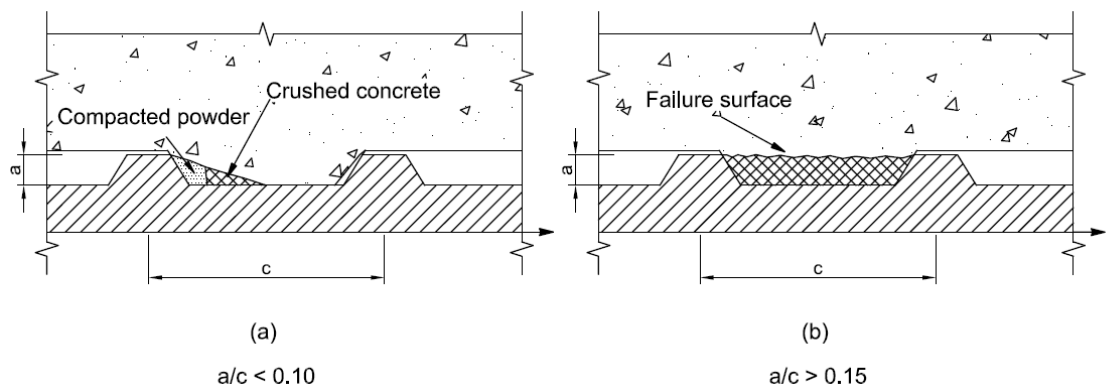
8 Bond failure mechanism between ribs of deformed bar
